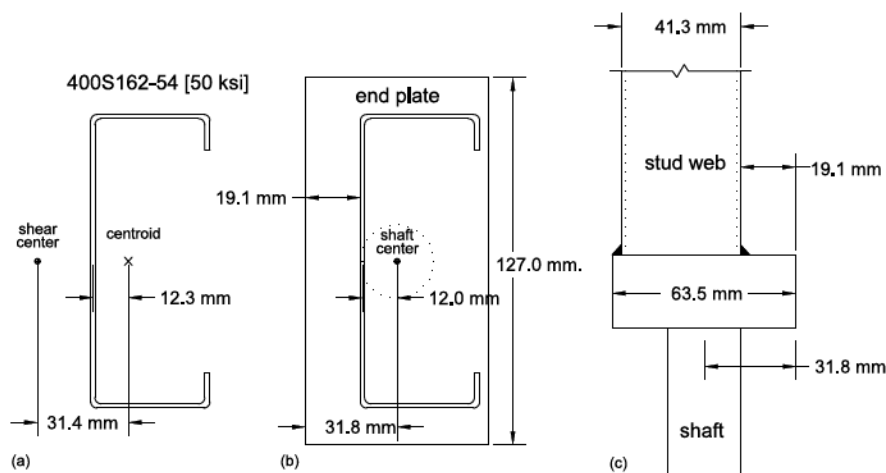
Typical test specimen, plan view showing (a) basic design, and (b) size and location of end plates and (c) elevation view of stud, end plate, and shaft
